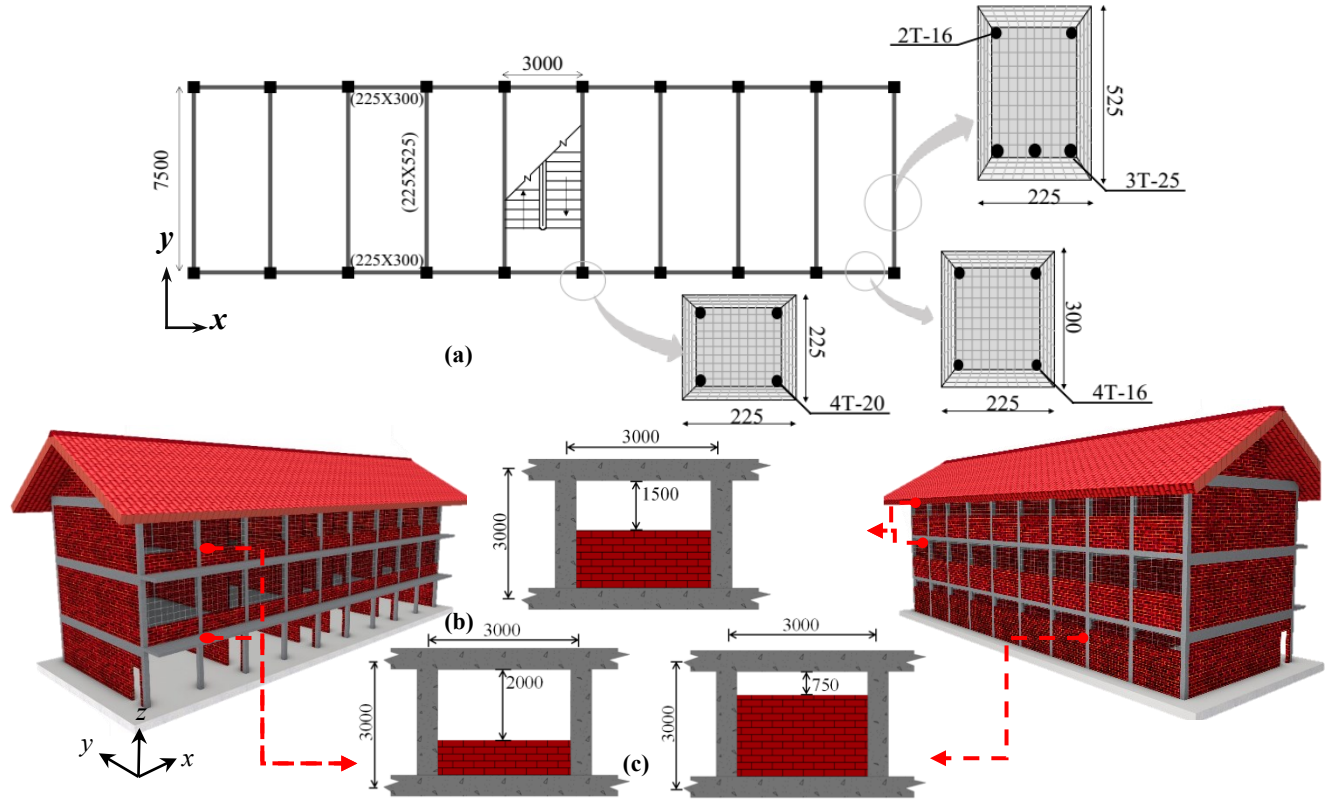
(a) layout of T1 building, (b) three storey T1 building and (c) MI configurations.
